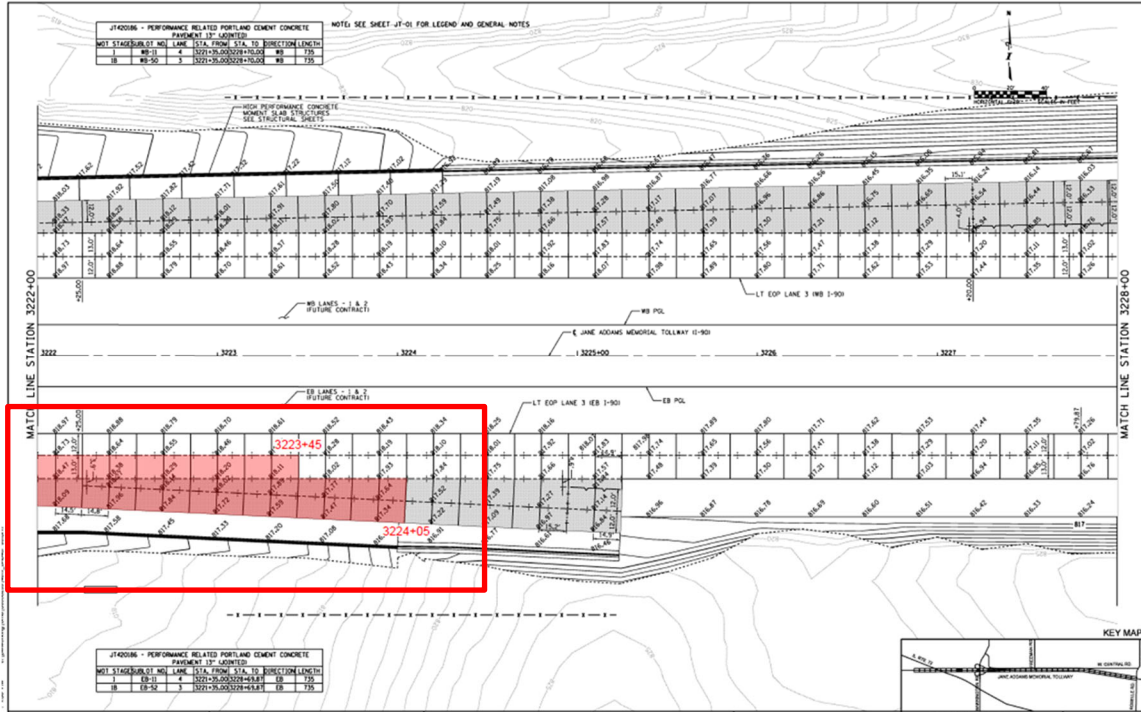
Failure locations next to Retaining Wall #4 (Station 3222+00).
